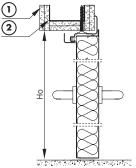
Installation of a single-leaf door with a corner frame to a masonry wall – vertical cross-section
